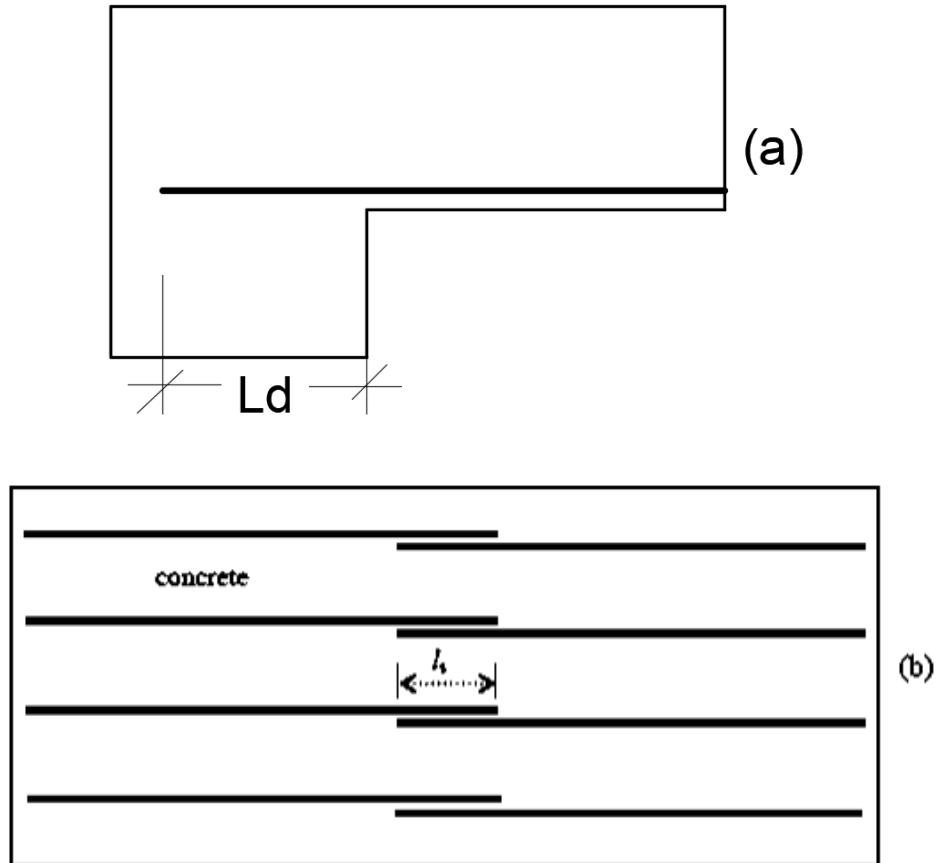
Typical cases in hand (a)anchorage (b) laps
